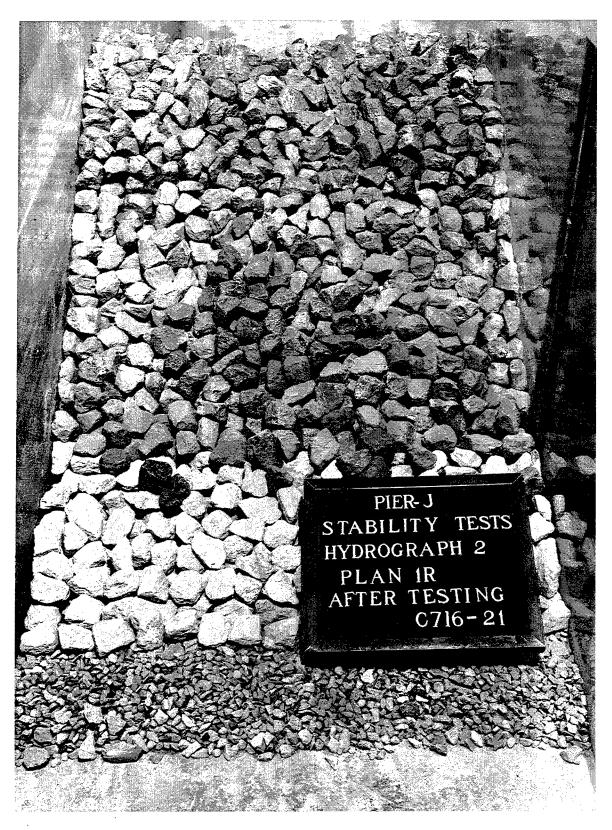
Sea-side view of Plan 1R at the conclusion of testing
